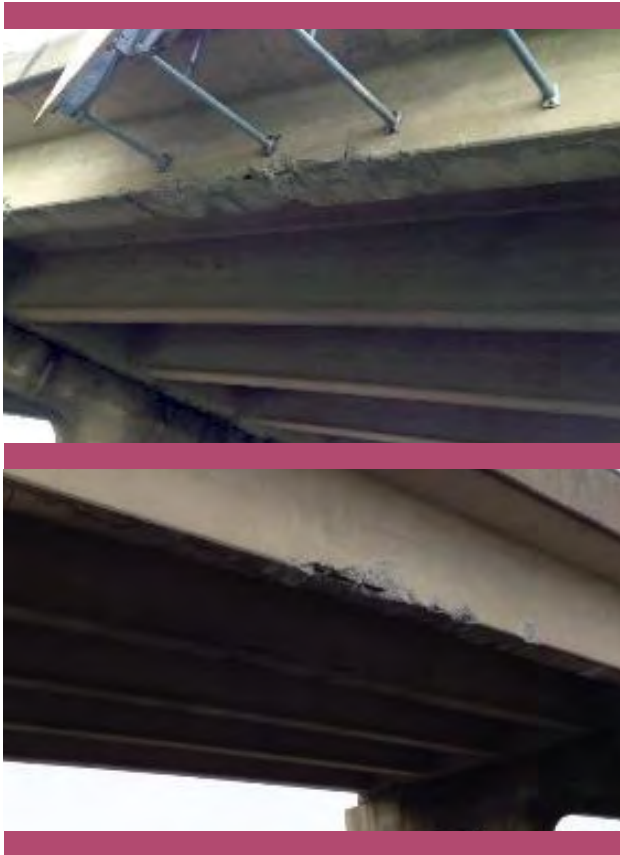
Impact-damaged reinforced concrete (RC) girders.
